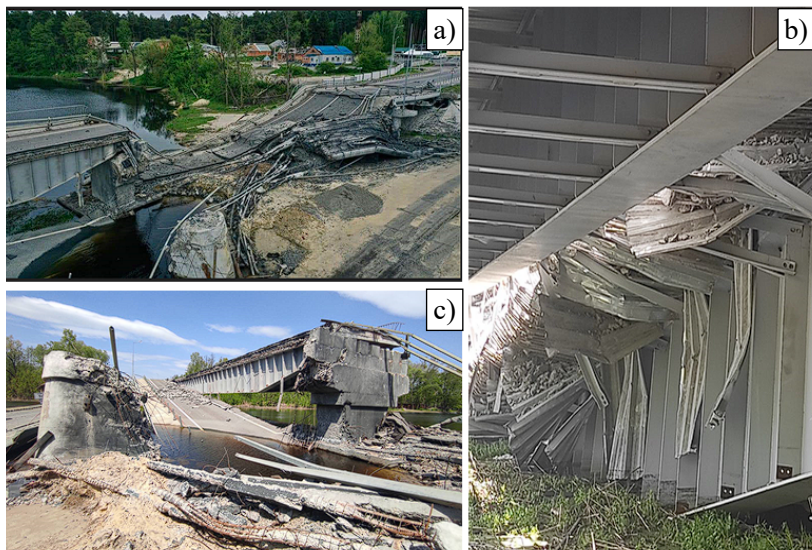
Damage to the bridge structure because of military operations: a) general view of the destroyed structure; b) destruction of the span beam; c) destruction of the bridge support and crossbar
